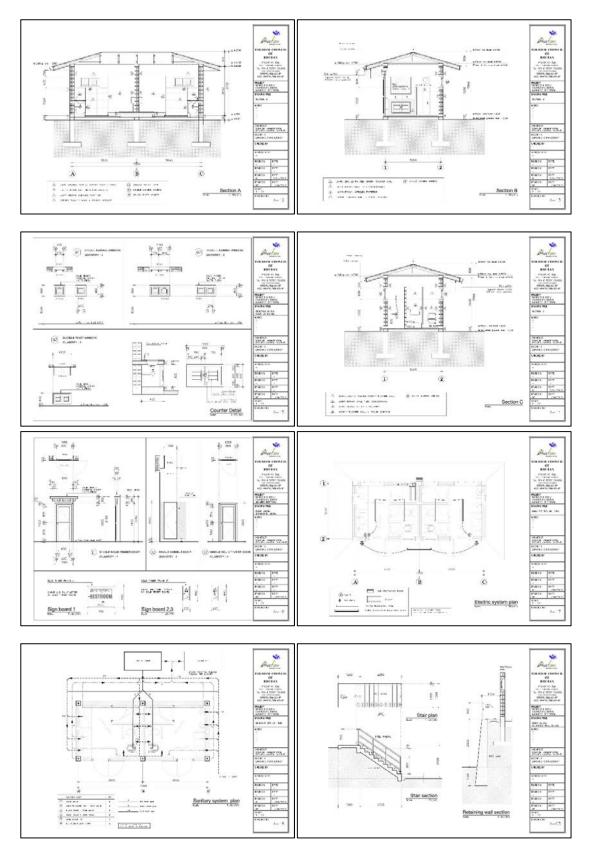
Construction drawings of Sangchen Dorji Lhundrup nunnery restrooms
